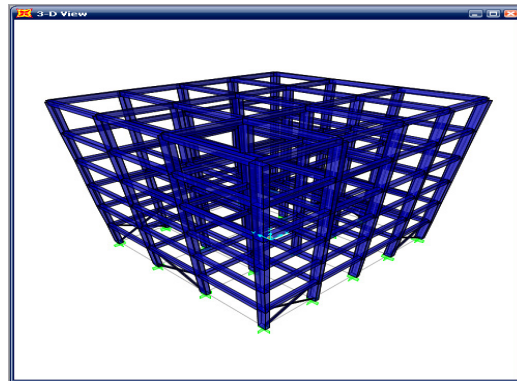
Modelling of Updated Building Case-4 Steel Bracing [06]
